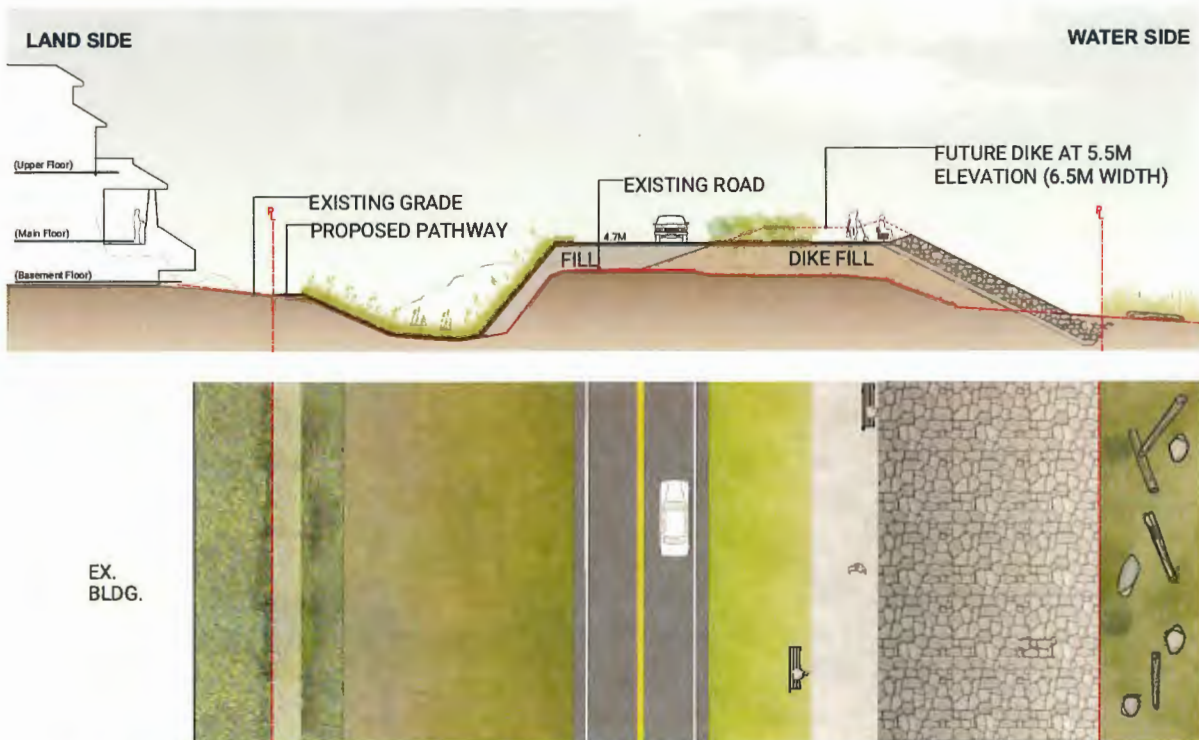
Section B – Section and Plan View of the Preliminary Dike Design near the London Landing Homes
